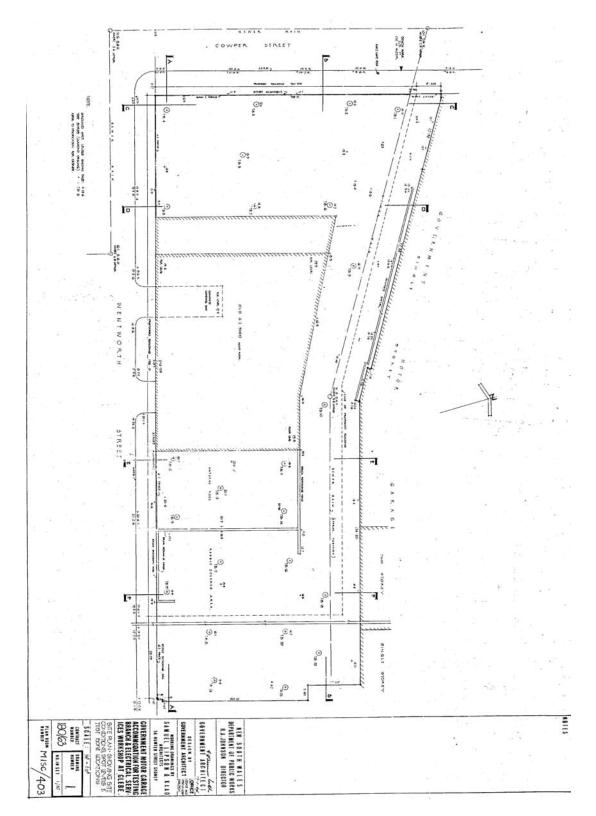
Site plan of the Testing and Inspection Branch building of the Public Works
